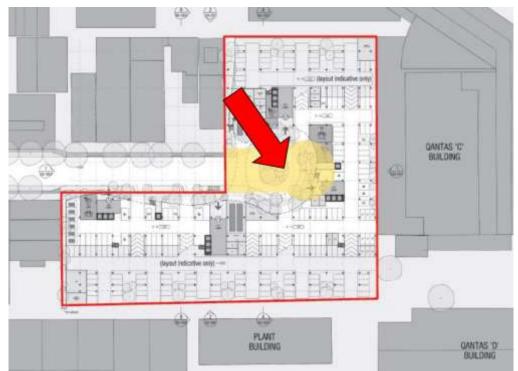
Locality Plan of the site with existing road highlighted in yellow
